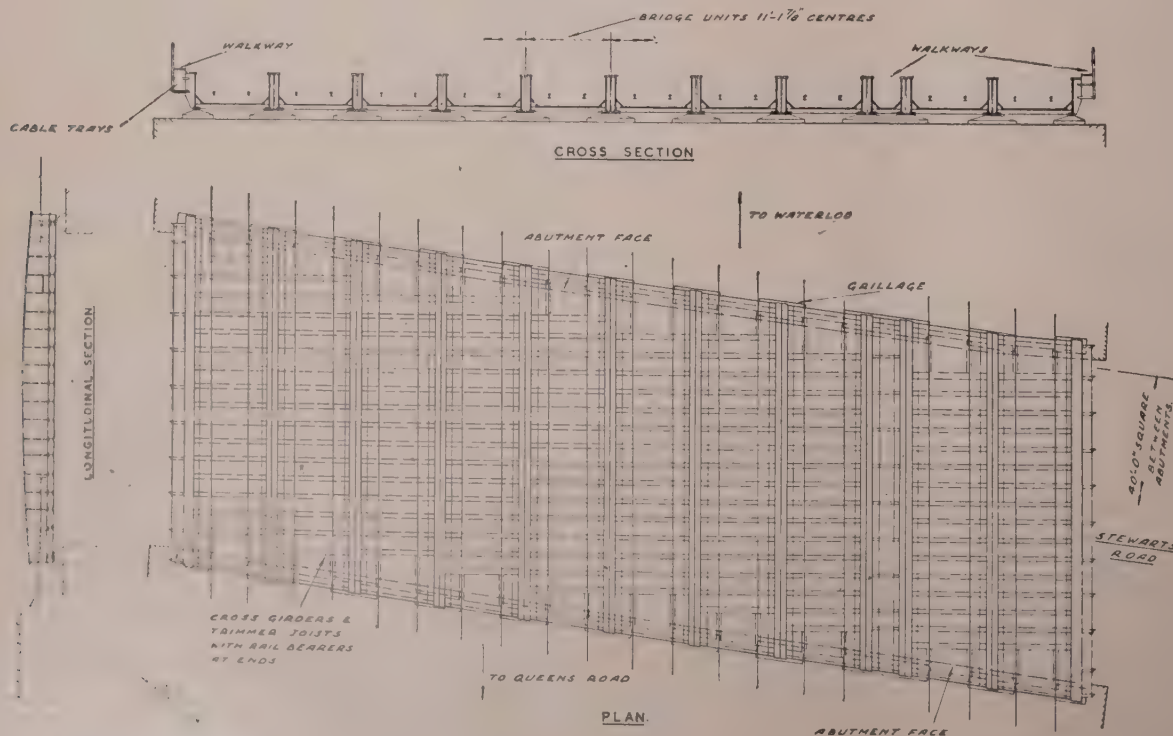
Stewarts Road Bridge. General arrangement of spans
